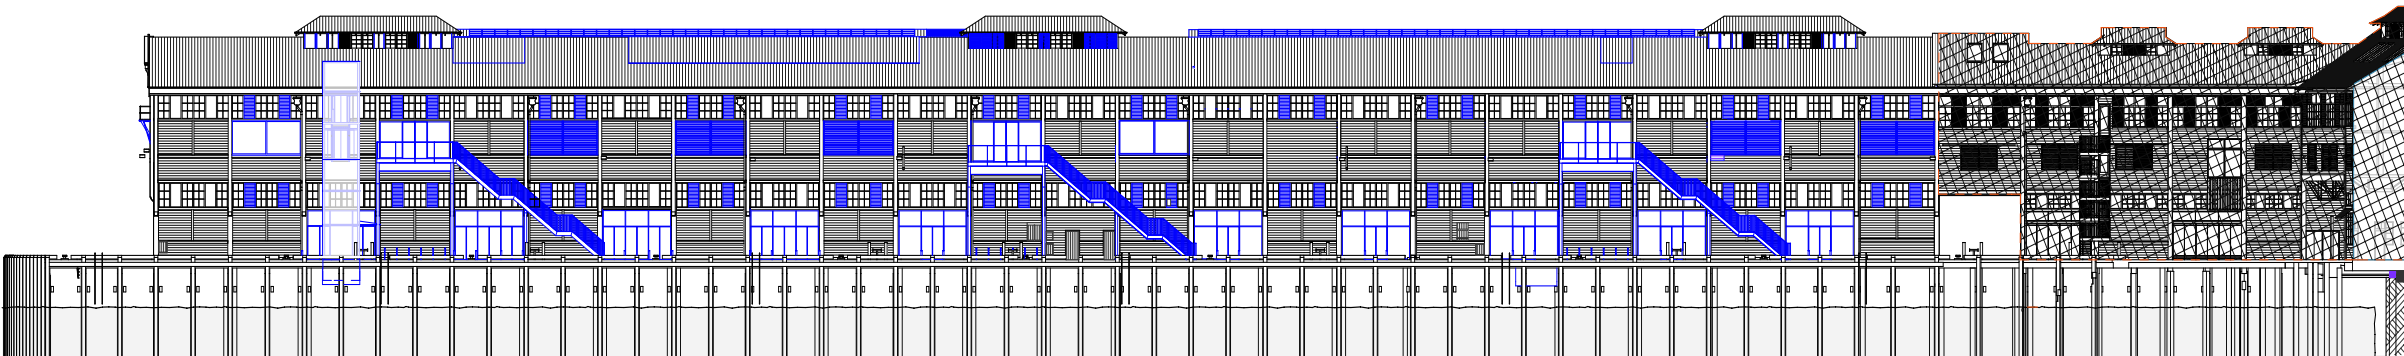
Proposed west elevation Pier 2/3, (alterations shown in blue).
